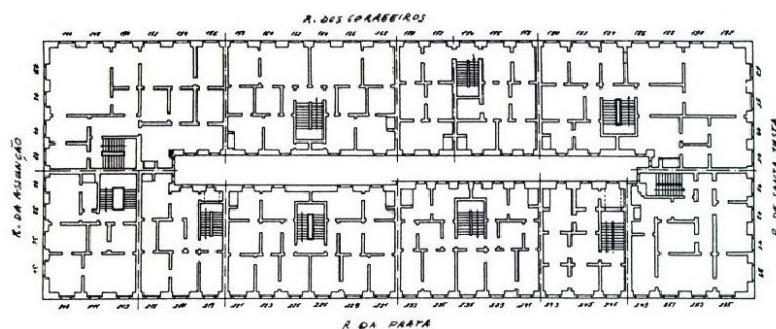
Plan of the 1st floor of a 'pombalino' quarter (Mascarenhas, 2005).
